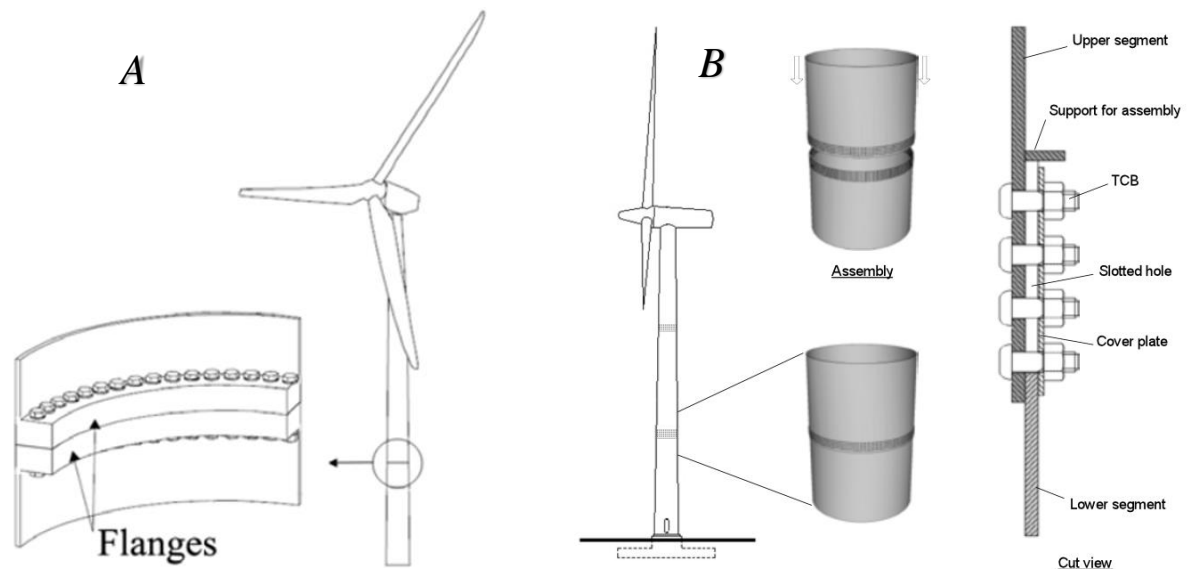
Different methods for the assembly of the tubular segments A) Traditional welded flange bolted connection B) Friction connection (Histwin, 2012)
